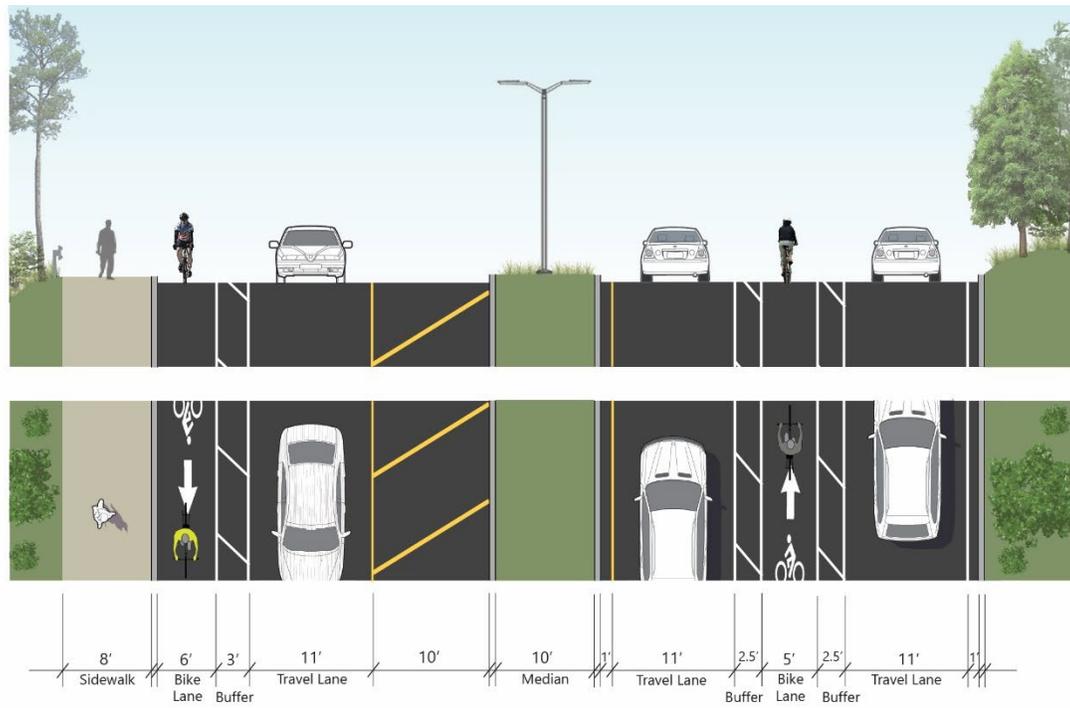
Section B-2: Proposed South Street, facing east (DRAFT CONCEPT)
